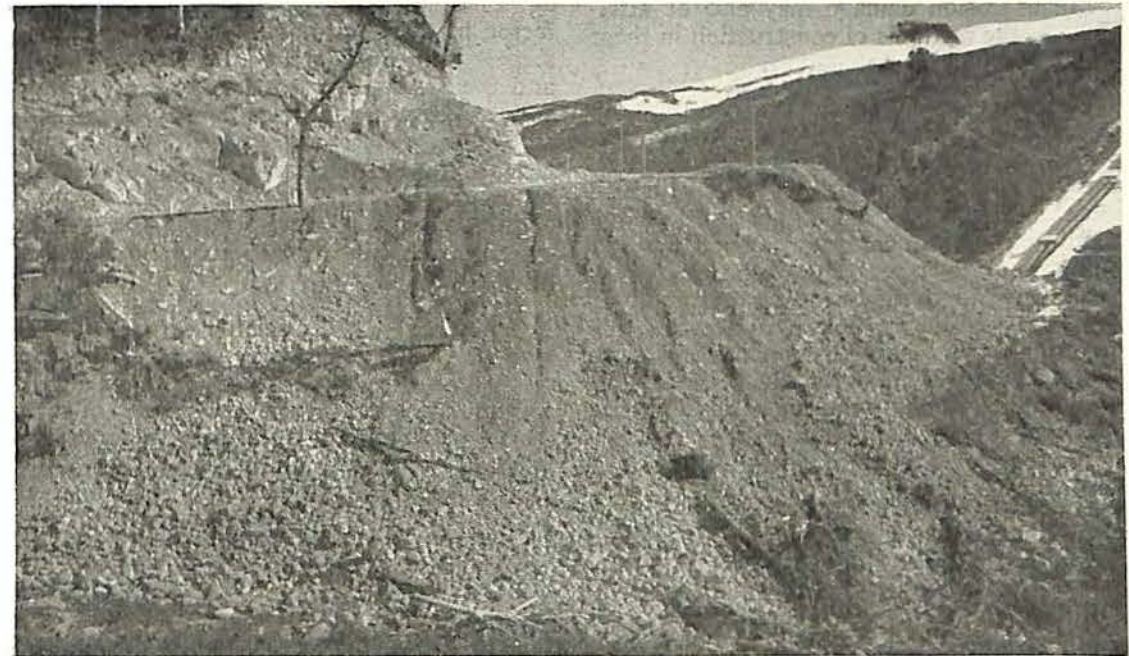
Vegetation destroyed by dumping excavated spoil downslope during road construction near Mundayang.
